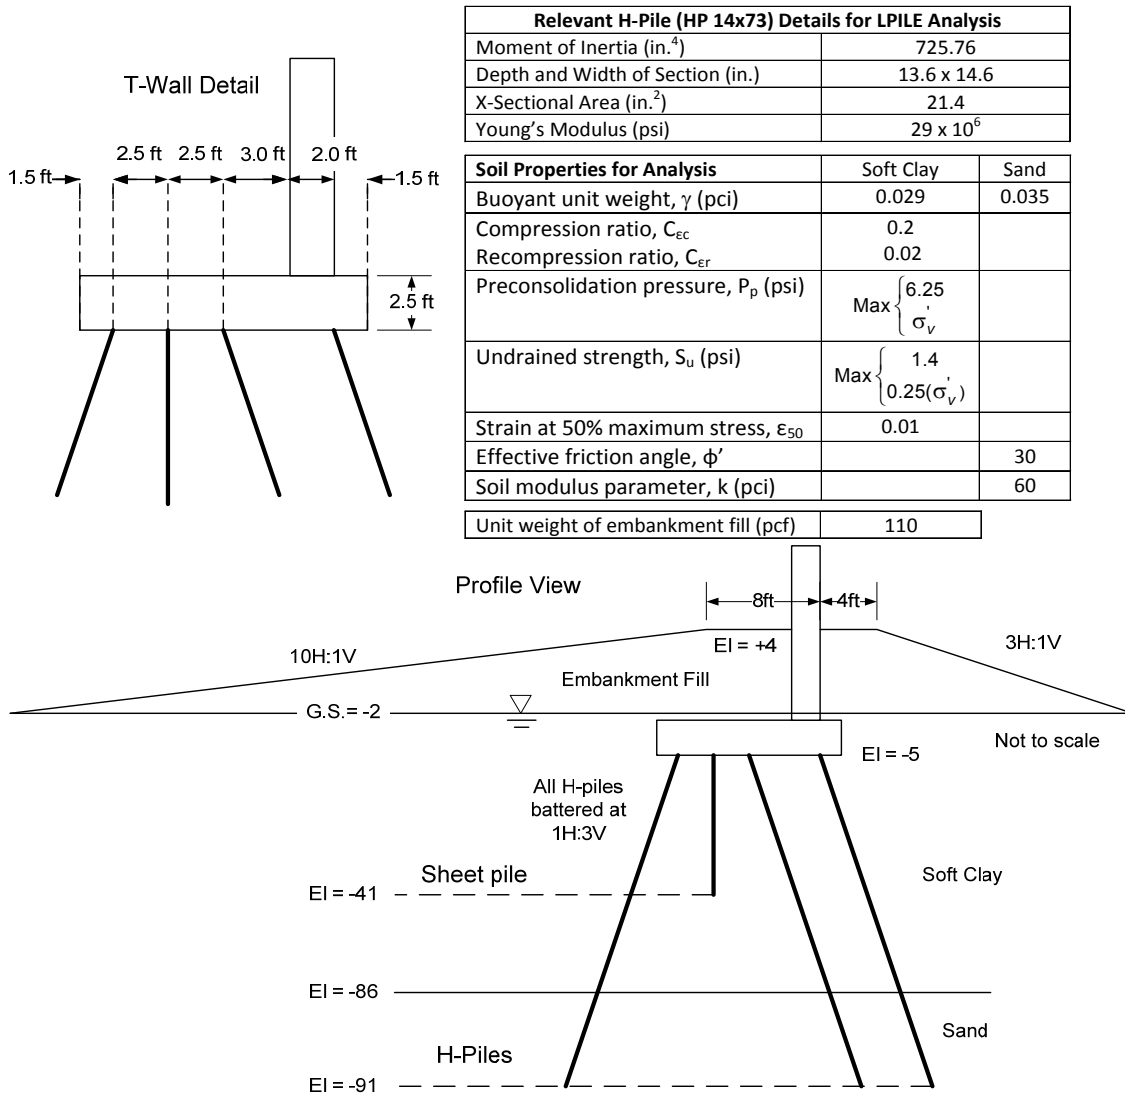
T-Wall, piling, embankment geometry, and relevant information for example problem
